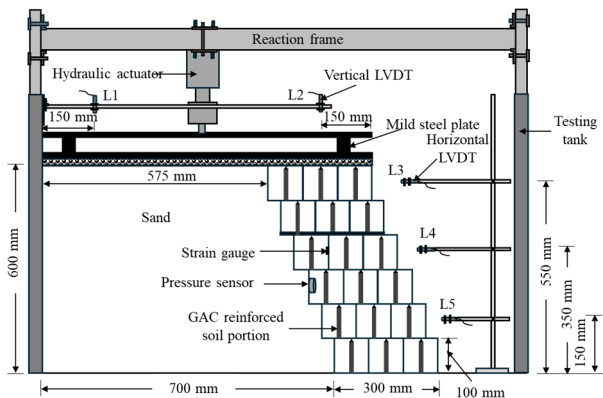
Schematic view of the geocell-GAC retaining wall model test setup.
